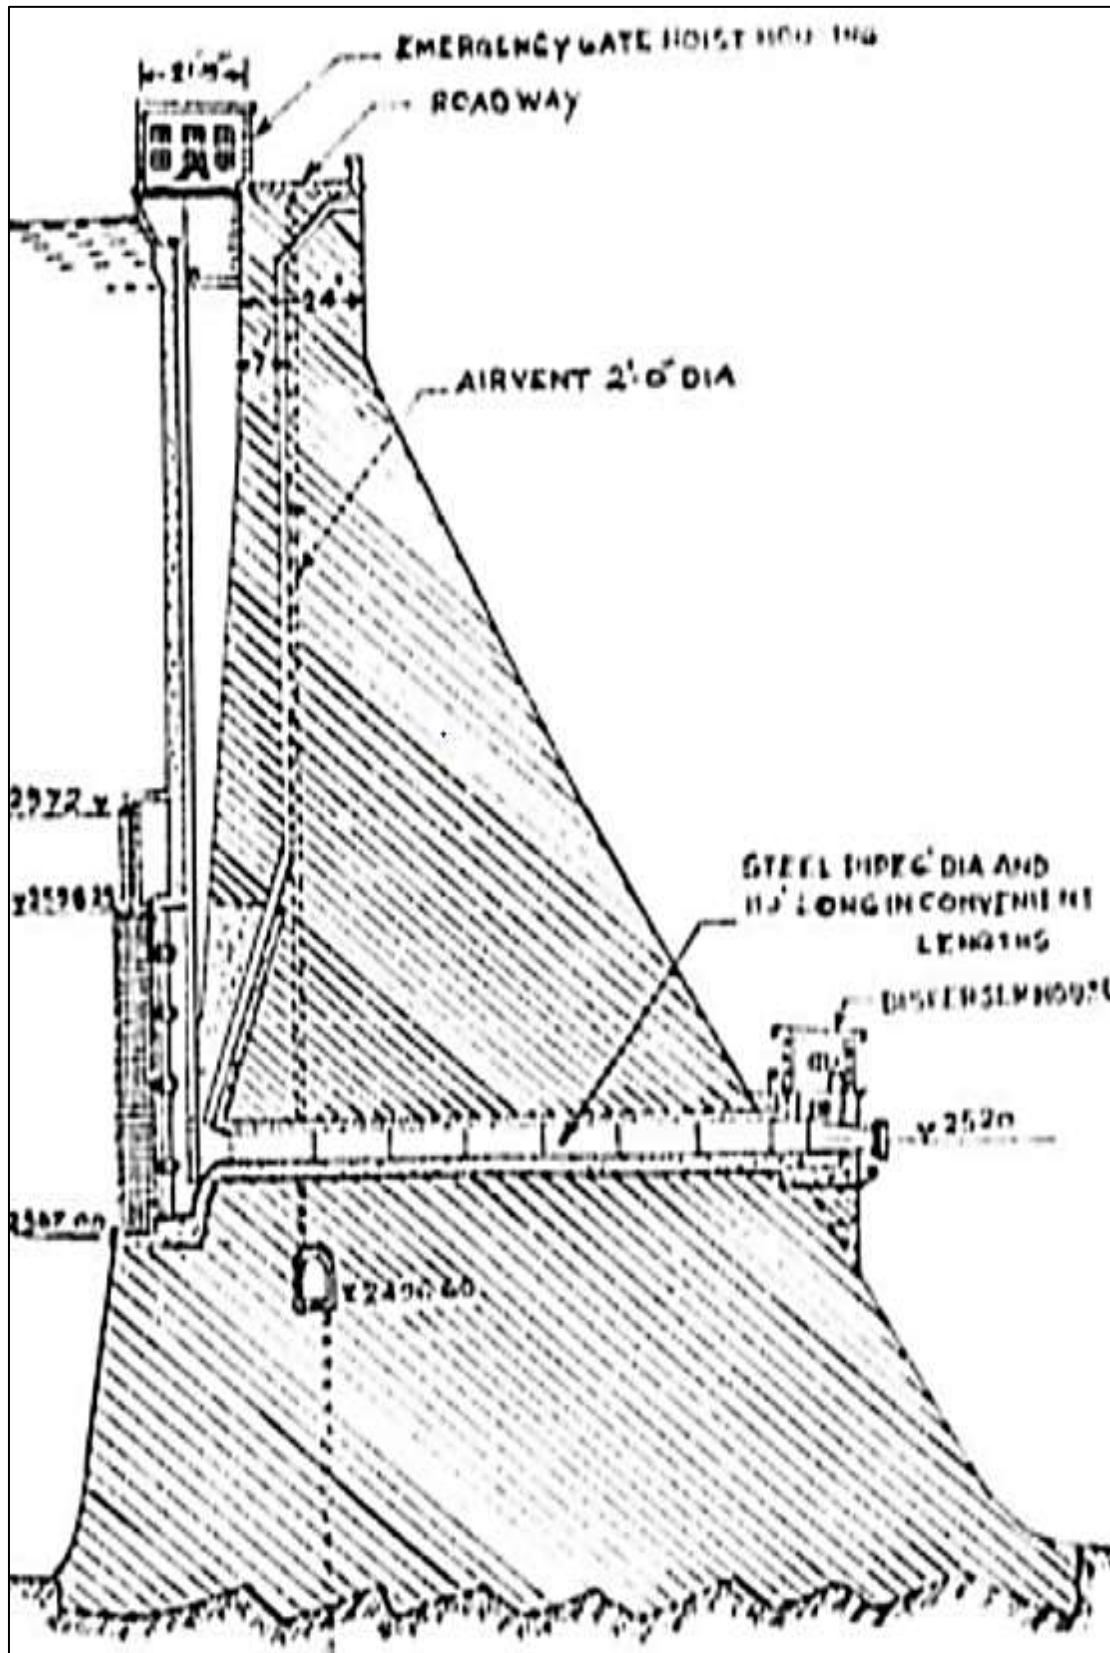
Section of Main Dam through center line of Outlet Pipe
